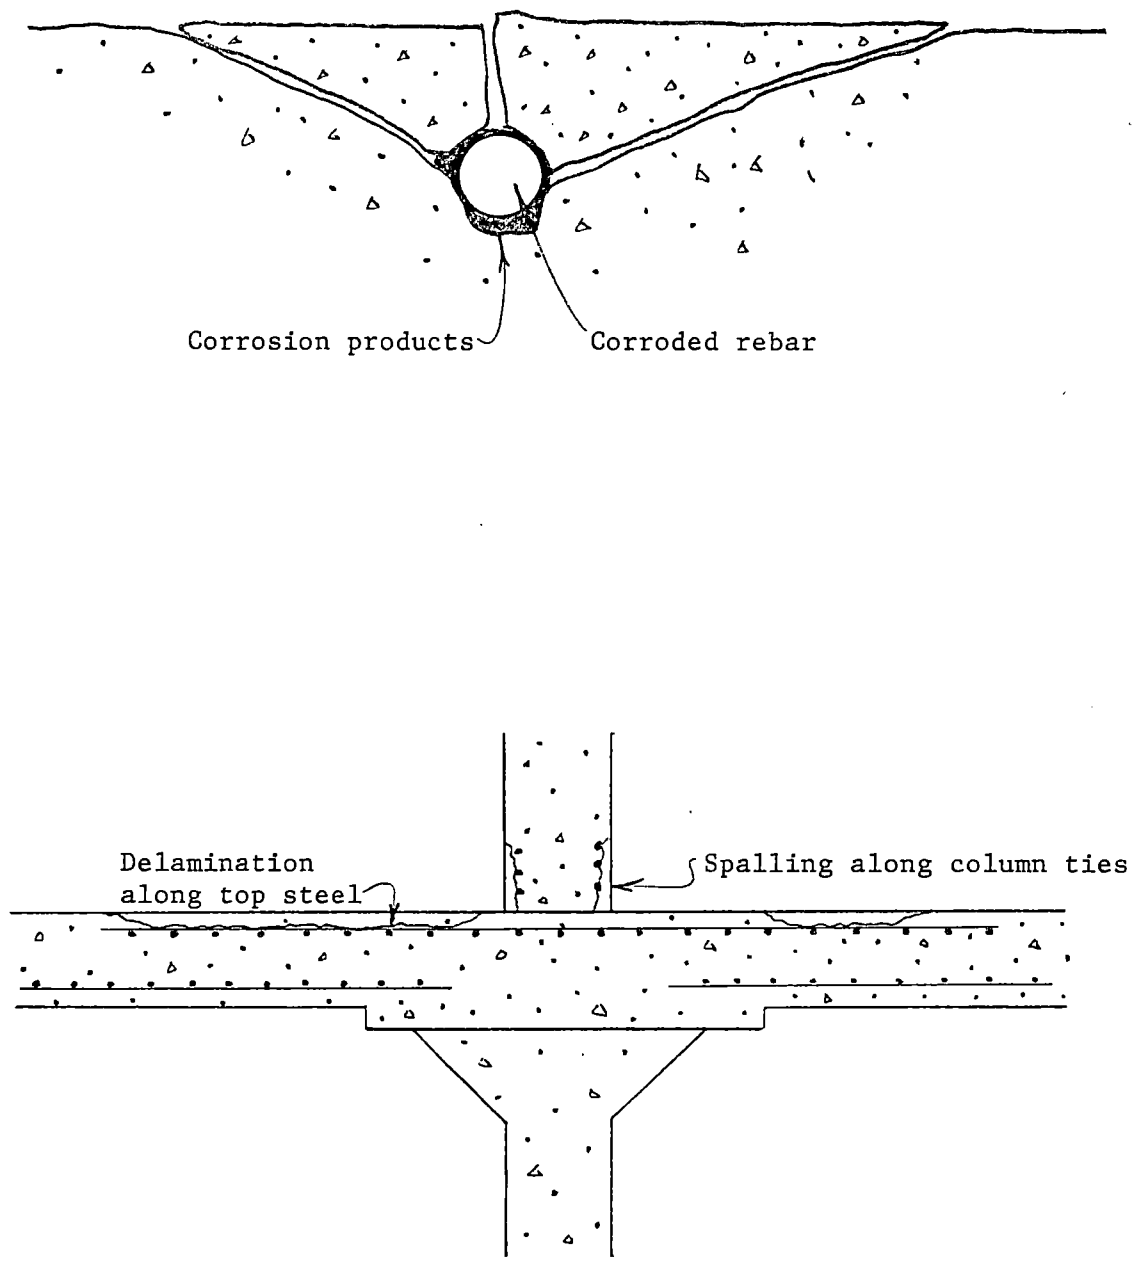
Typical delamination and spalling due to corrosion
